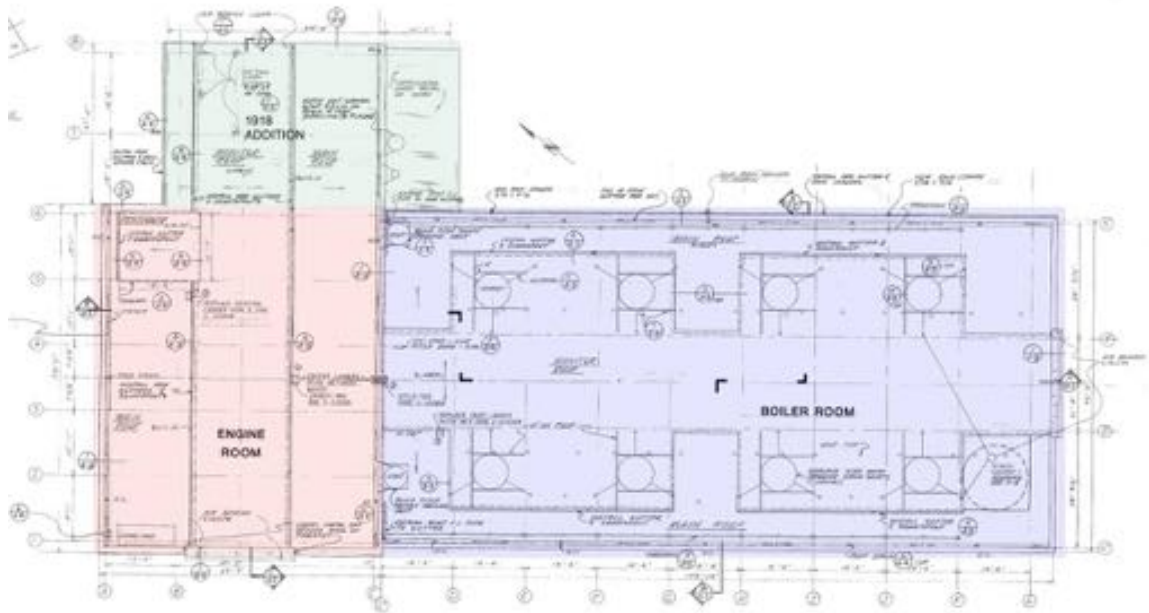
Plan view of Georgetown Steam Plant. Plan north is to the left.
